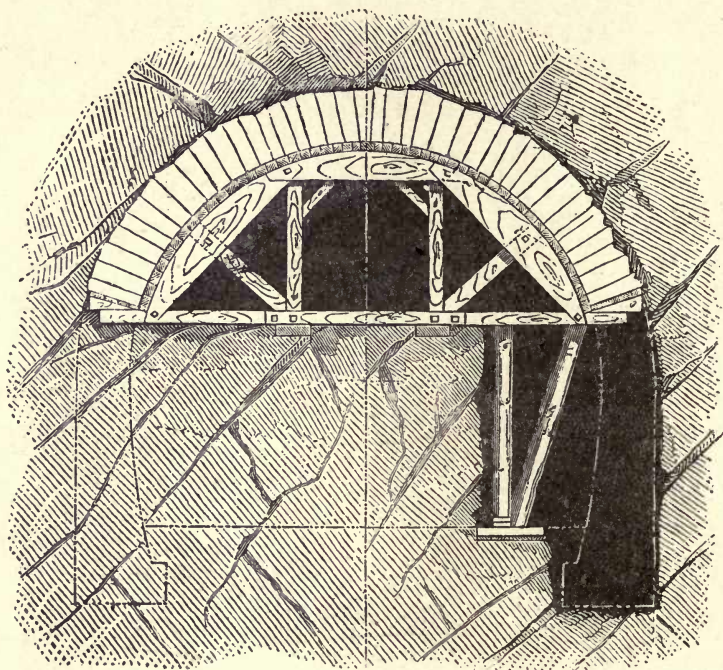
The Belgian Tunnel System: St. Cloud Tunnel.
